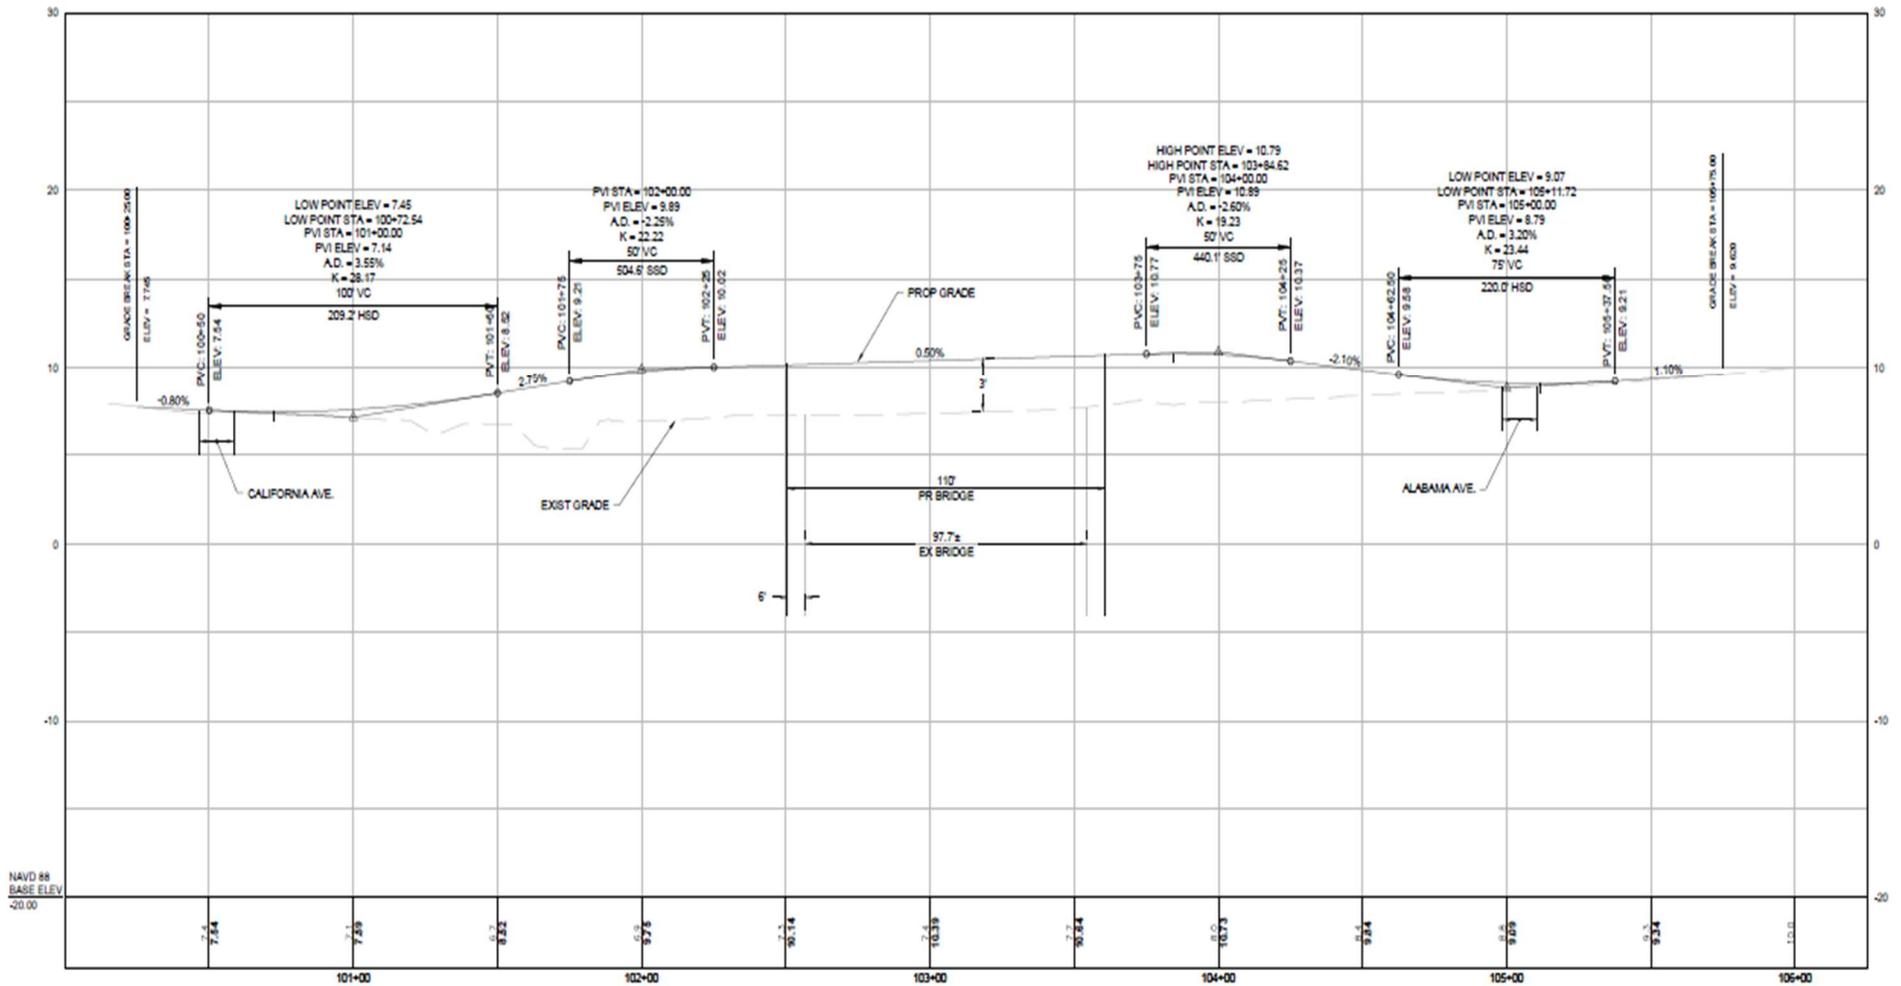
3-foot Raised Profile of Ames Avenue Bridge - Option 2
